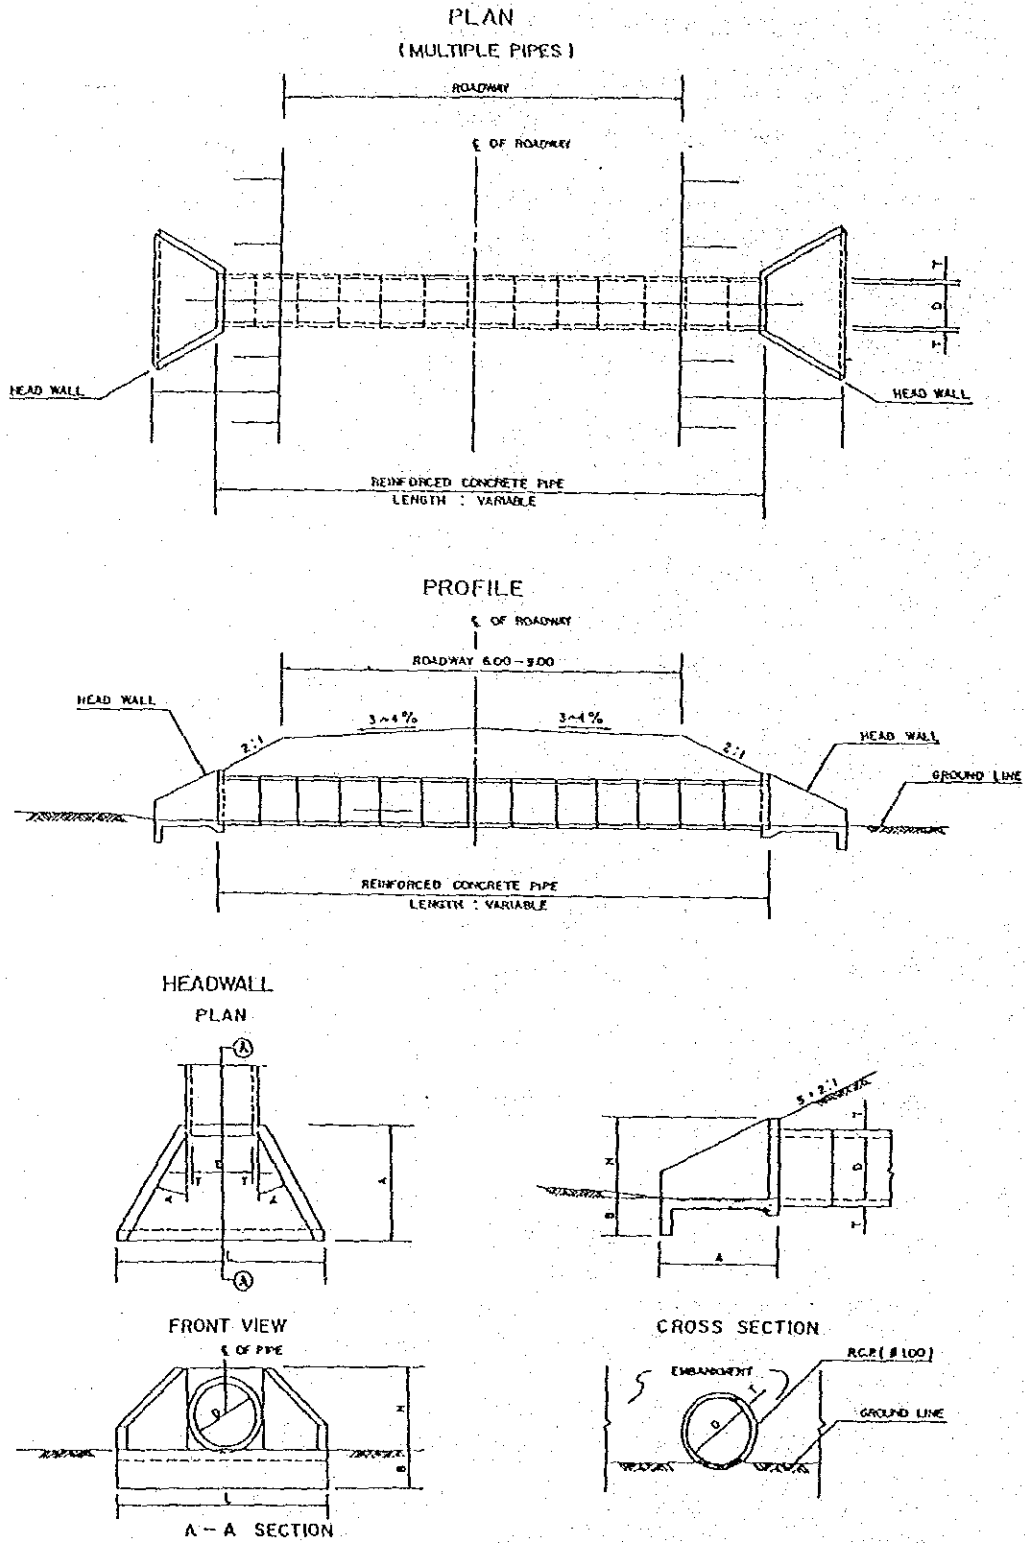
TYPICAL DESIGN OF PIPE CULVERTS
